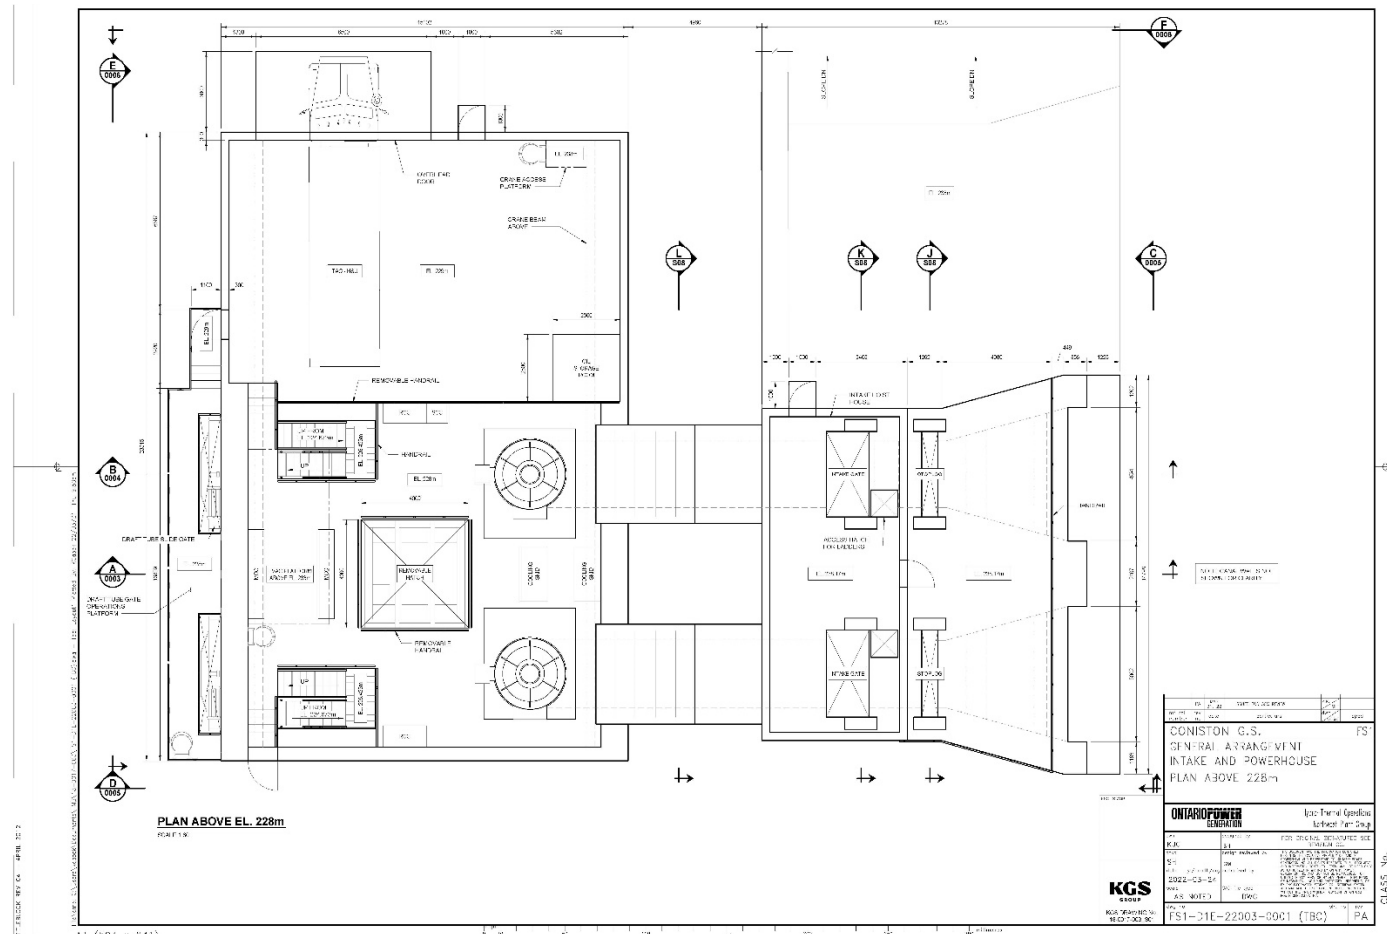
Proposed Powerhouse Arrangement for Intake and Power at Plan Level Above 228 MASL
